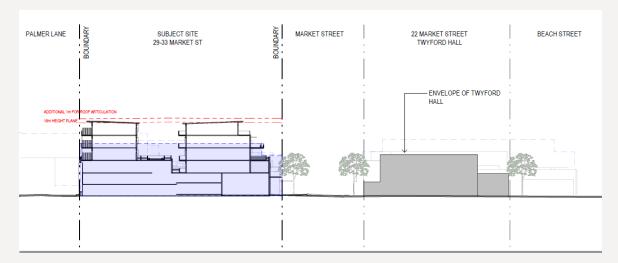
Cross-section of proposed building envelope in relation to heritage listed Twyford Hall
